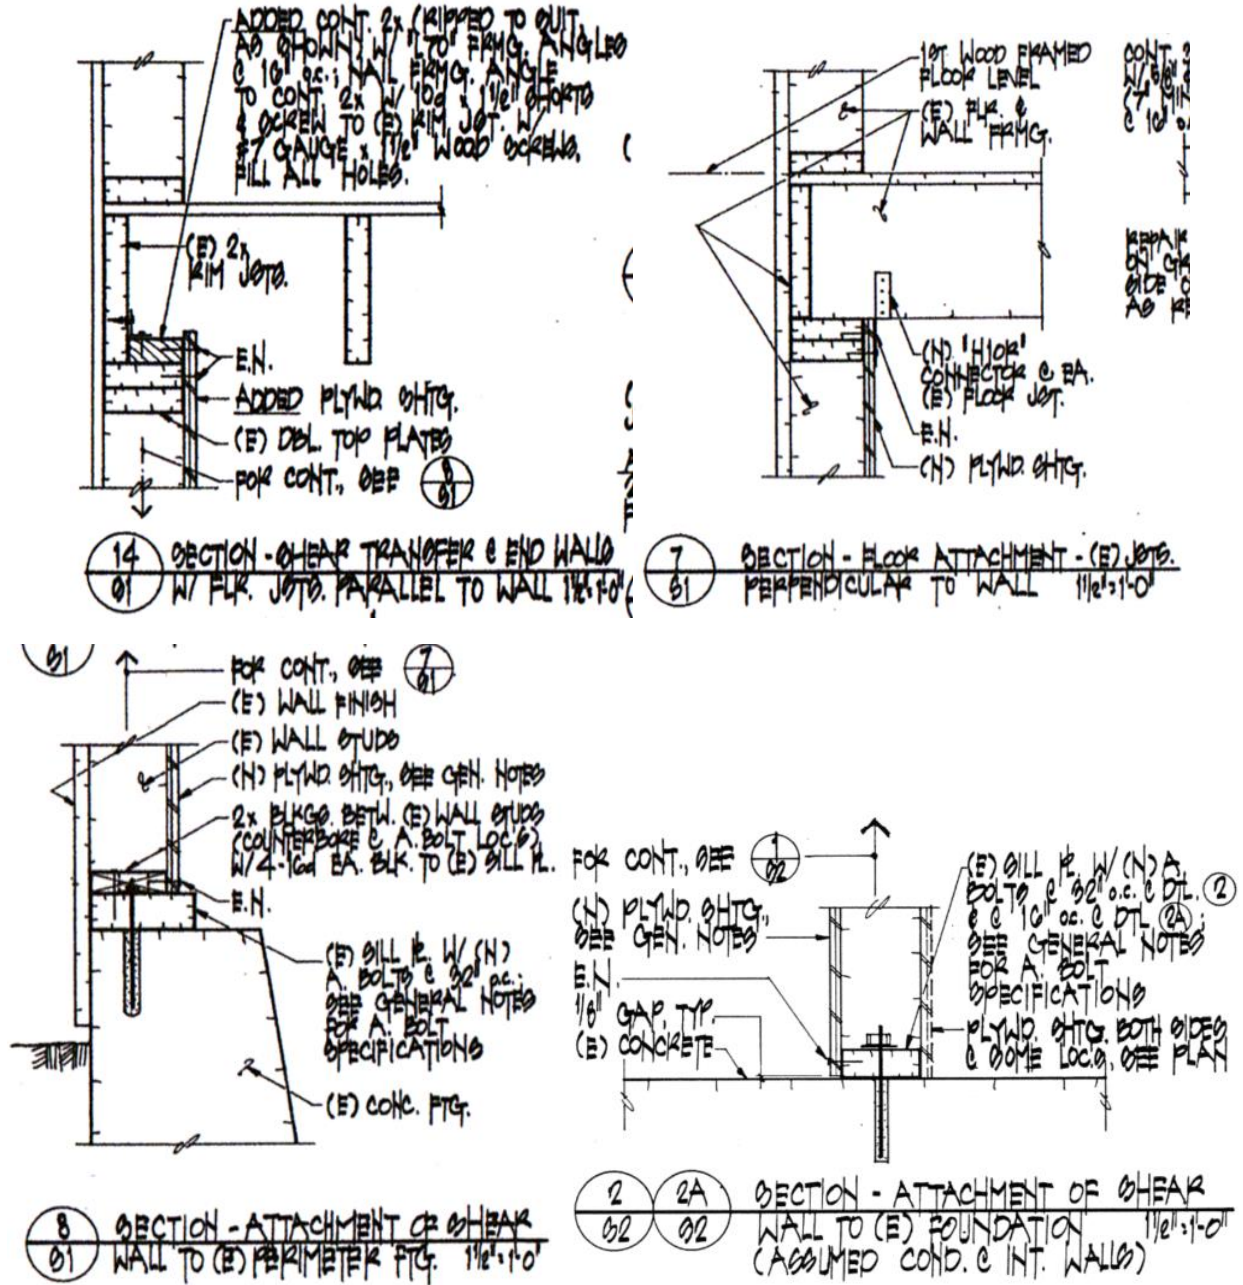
Selected Structural Retrofit Details (1994 drawings)
